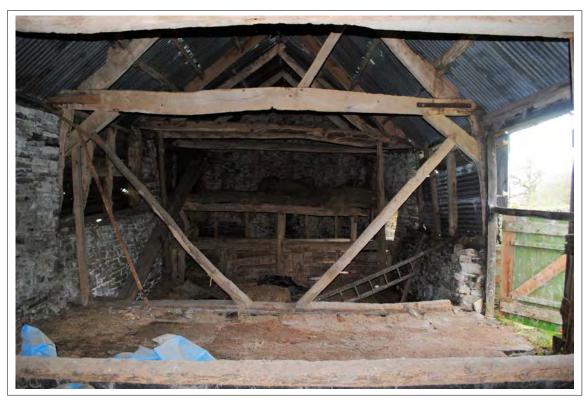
General view of Bays C to G, showing bracing in the foreground for Truss D. Looking south-southwest.
